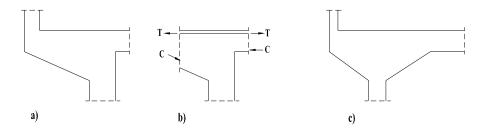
Elevation of corbel and internal beam (a) discontinuity, (b) unbalanced internal forces and (c) improved arrangement of the joint
